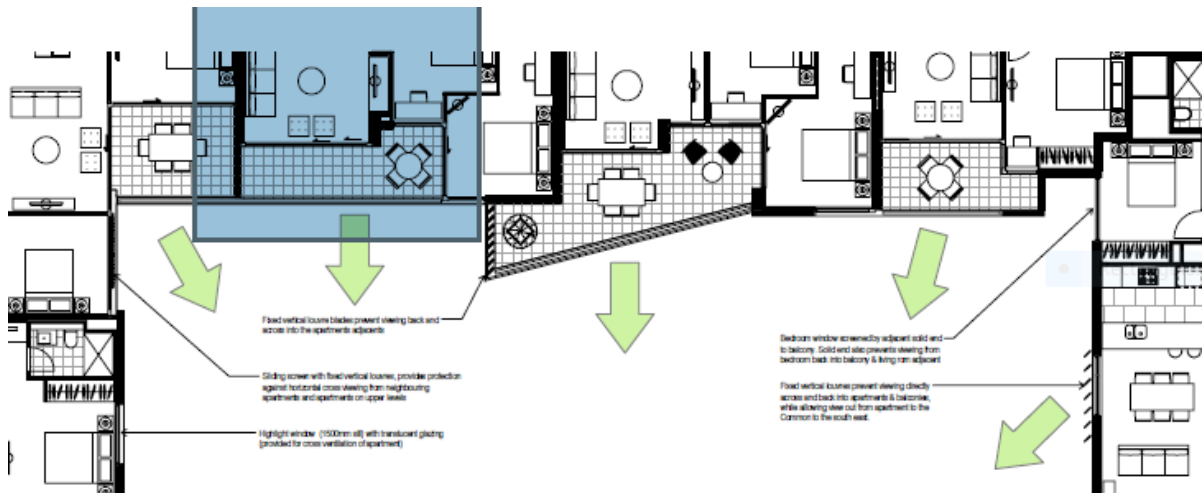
Extract of Drawing SK0022 – “Building A Internal Corner Screening”
